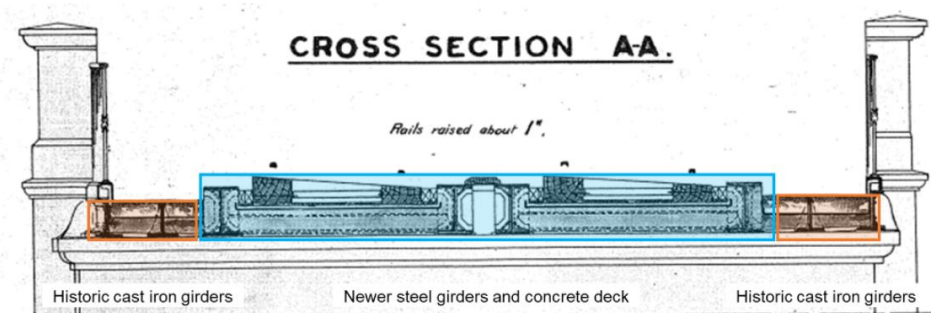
Cross- section of Toad Holes Underbridge (MDL1/12) with original cast-iron girders highlighted in orange and the later twentieth century concrete decks highlighted in blue.
